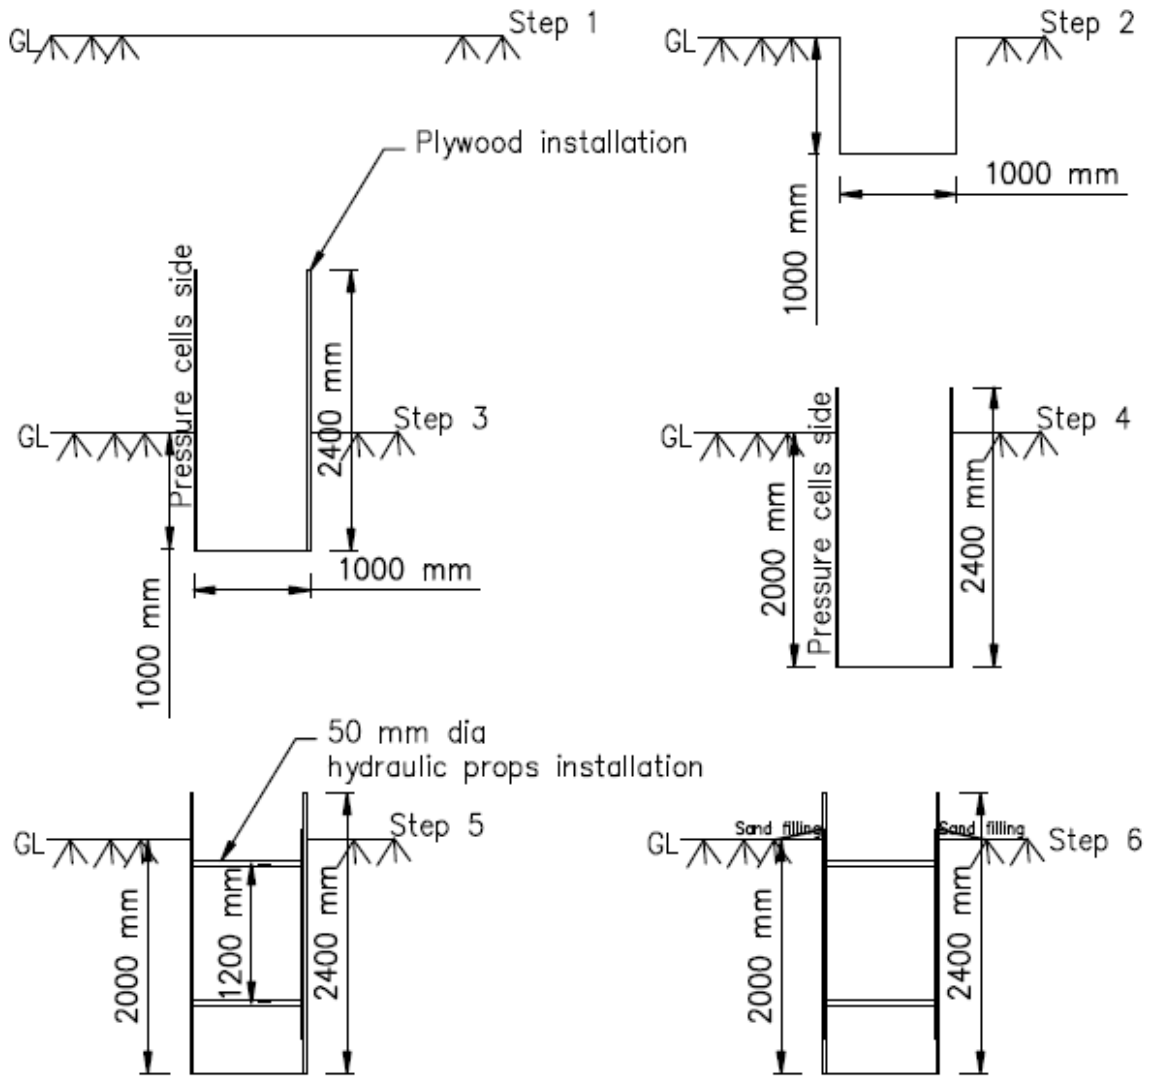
Excavation / Construction sequences for Hydraulic shoring with Ply wood sheeting in a trench.
